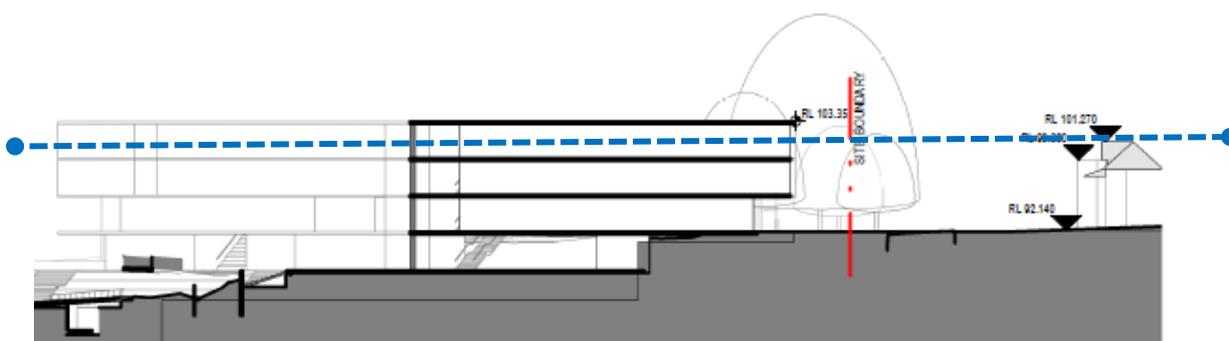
Centennial Avenue Campus – Heritage Building Cross Section. The blue arrow indicates the approximate two storey height from heritage item I66 across Centennial Avenue towards the proposed Building Q. Source Architectus. Overlay by the author. December 2019.
